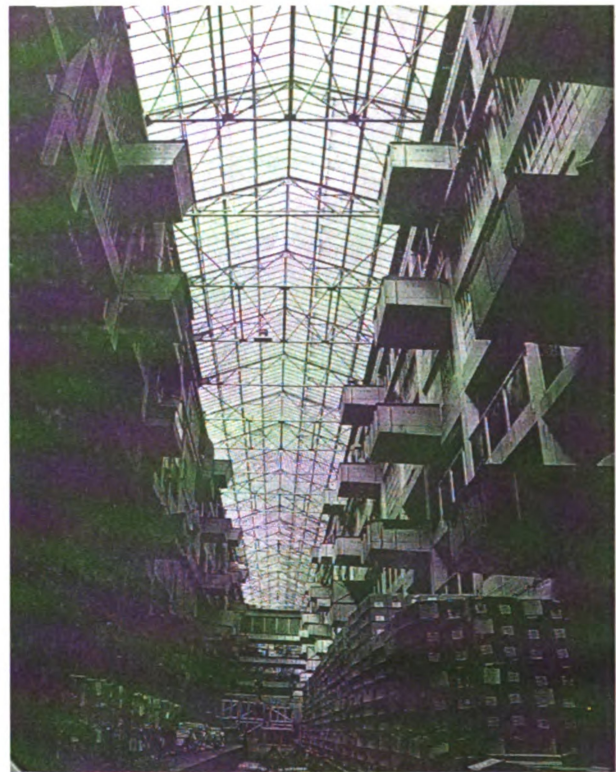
Photo of the interior craneway of the six-story extension building, just prior to completion.
